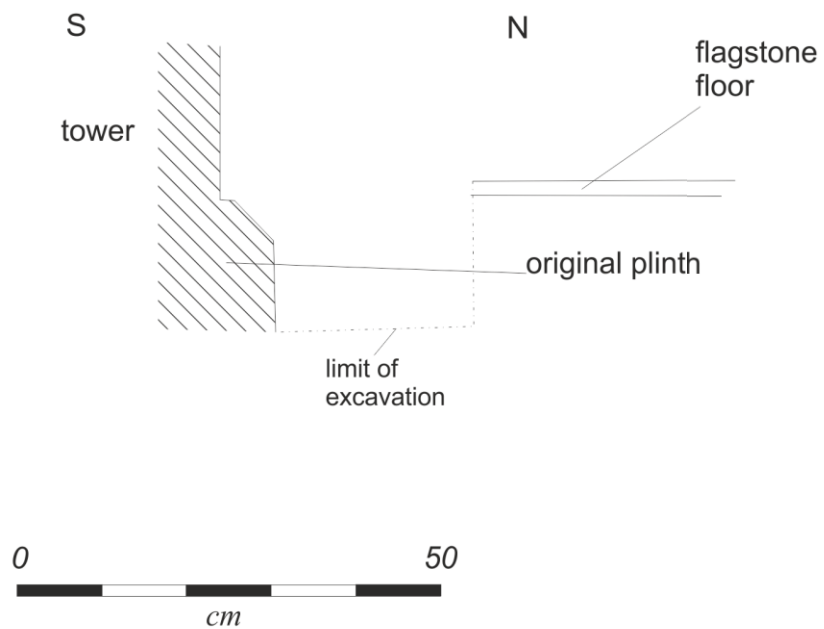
Section at B marked on Fig. 2 showing service trench dug along north side of tower inside the vestry. Scale 1:10
